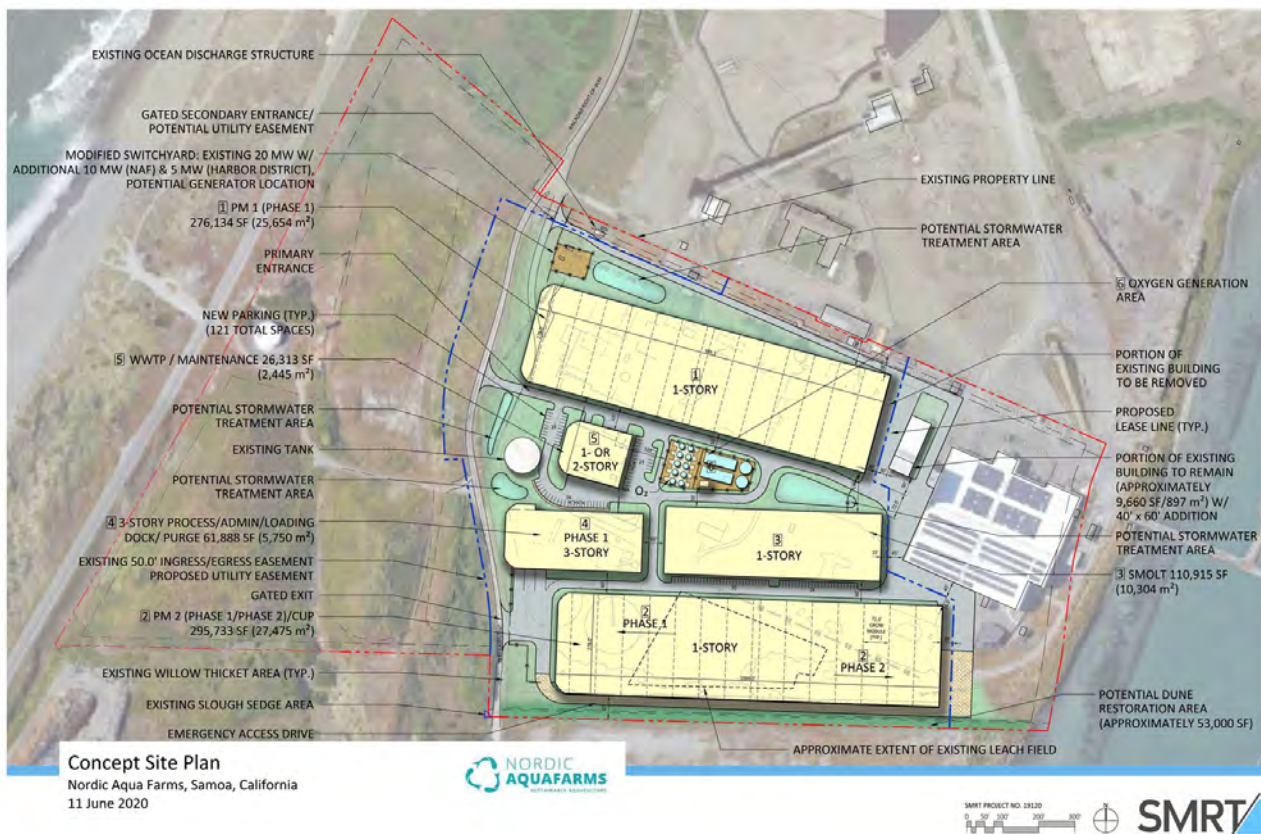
Proposed Facility Site Plan (configuration subject to minor modifications/alignment)
